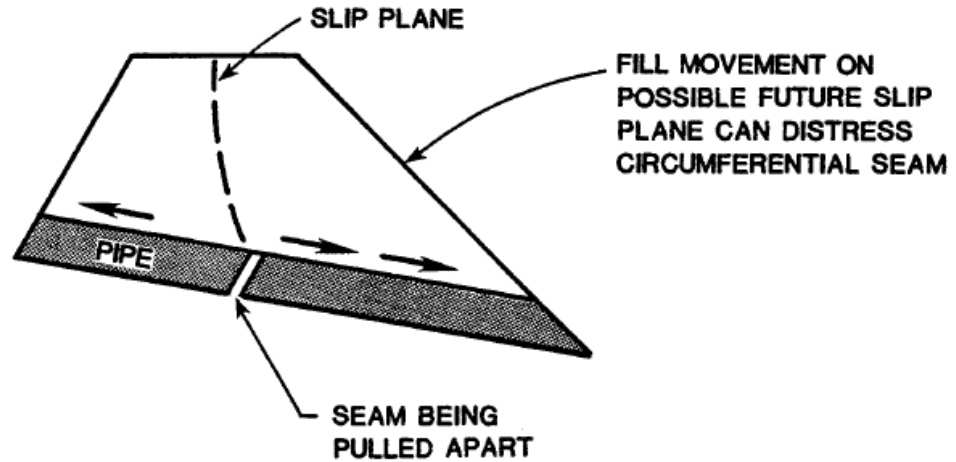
(Exhibit 72) Circumferential Seam Failure Due to Embankment Slippage
